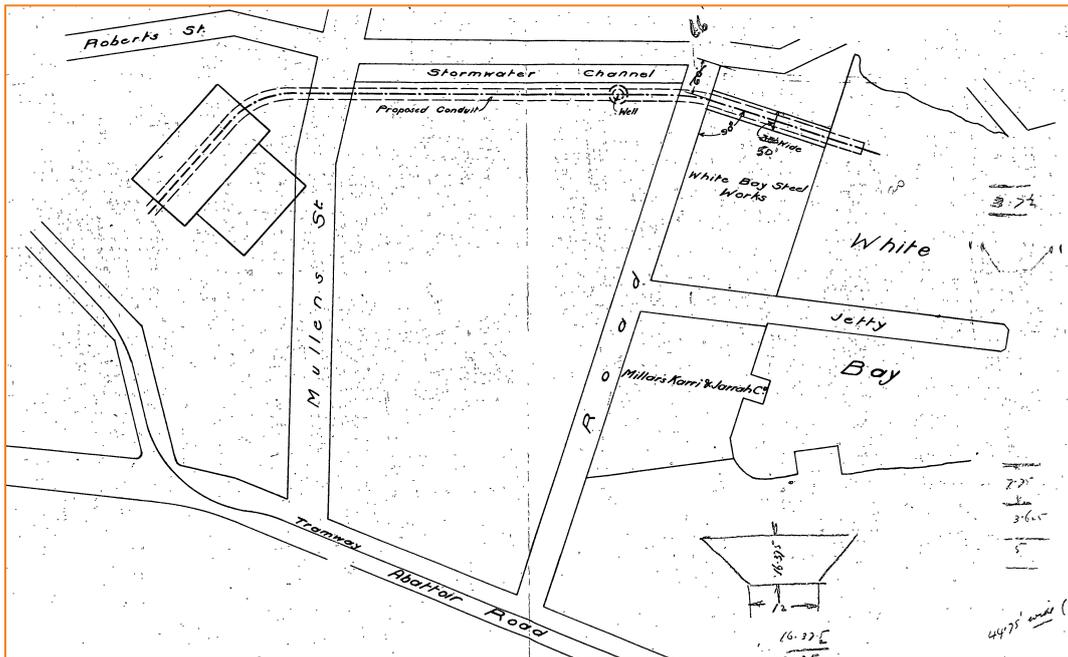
'NSWR, Wardell Rd to Darling Island Railway, Plan of Easement required on property occupied by White Bay Steel Works', 24 November 1911, showing the proposed location of the conduit and well at the top. Source: Transport for NSW Plan Room, 0240693
